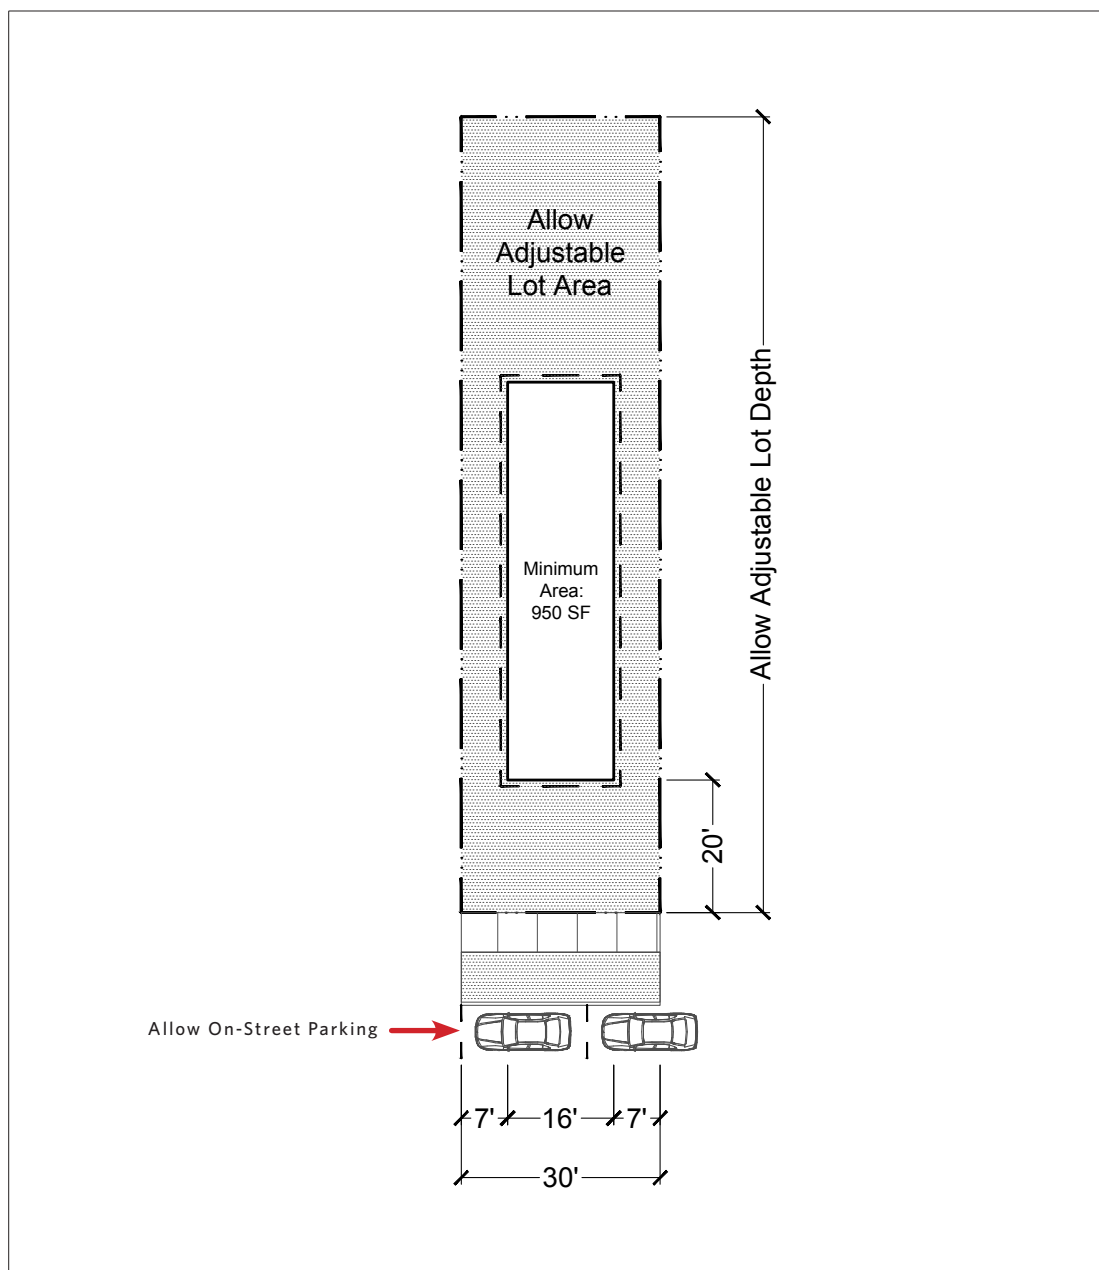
Lot Diagrams — R-2 Lot Configurations on Narrow Historic Lots with Reduced Minimum Building Width of 16 Feet
